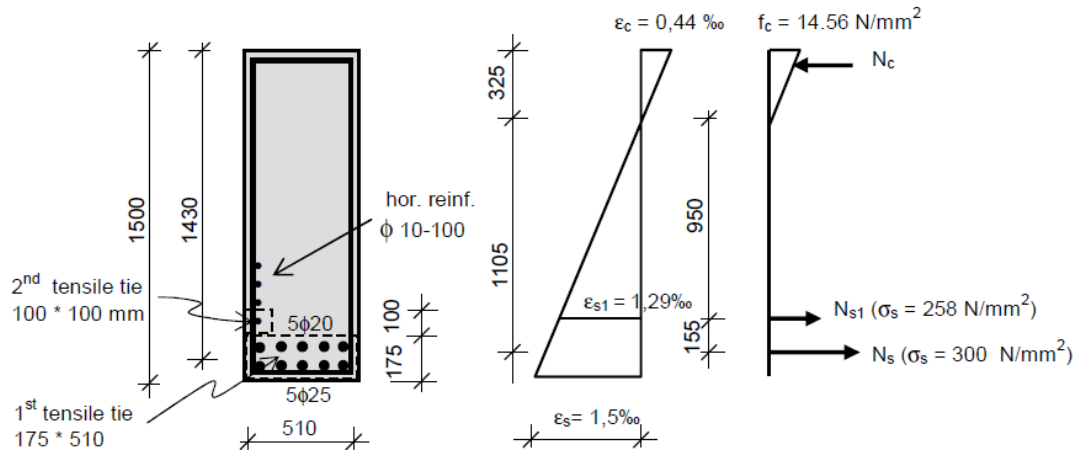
Working example: cross-section and reinforcement of deep beam (left) and strain distribution over the height of the beam in SLS (right)
